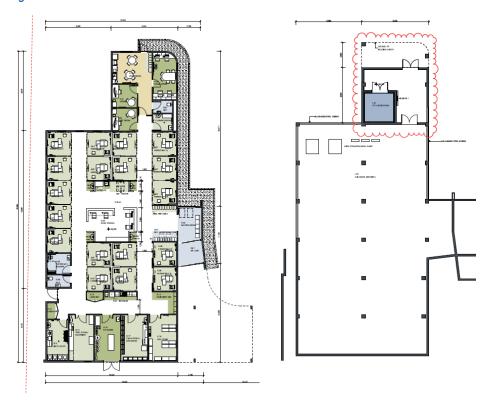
Floor plans, Ground (Renal Unit) and Lower Ground (Communications Room)
